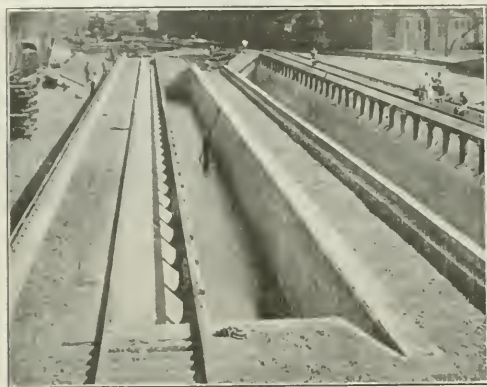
Reinforced Concrete Cinder Pits at Scranton, Pa.
